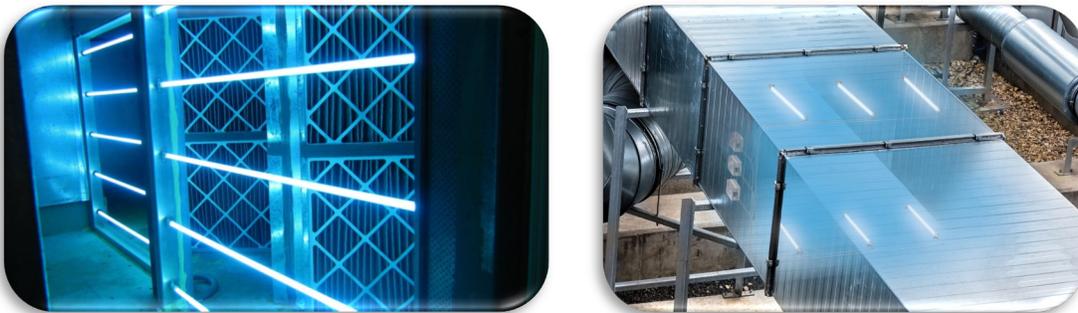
Typical Air Handling Unit (AHU) and In-Duct Installations
